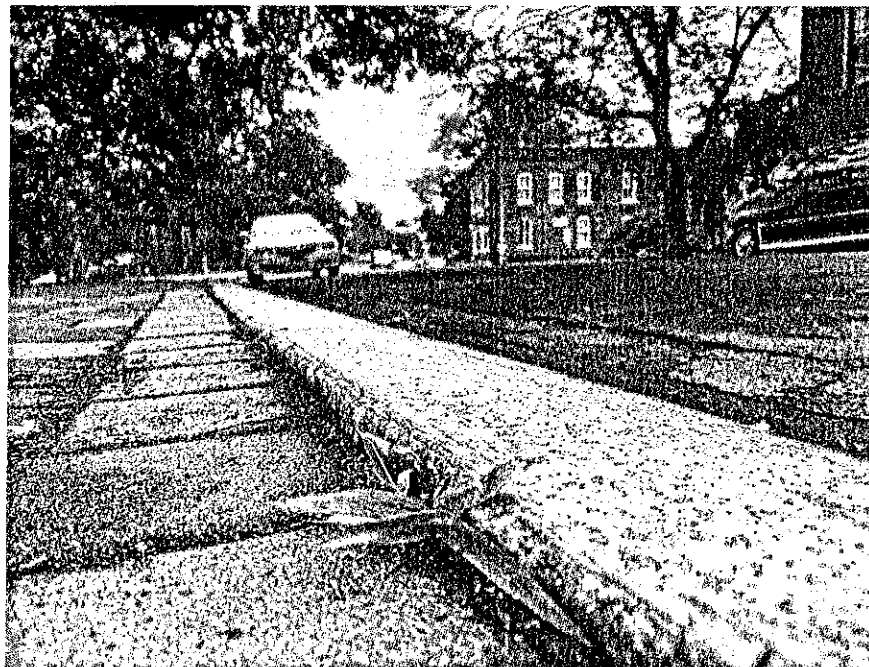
Representative photo of trip hazard at curb where sidewalk pavers have settled. This differential settlement also causes ponding of storm drainage on sidewalk surface.
